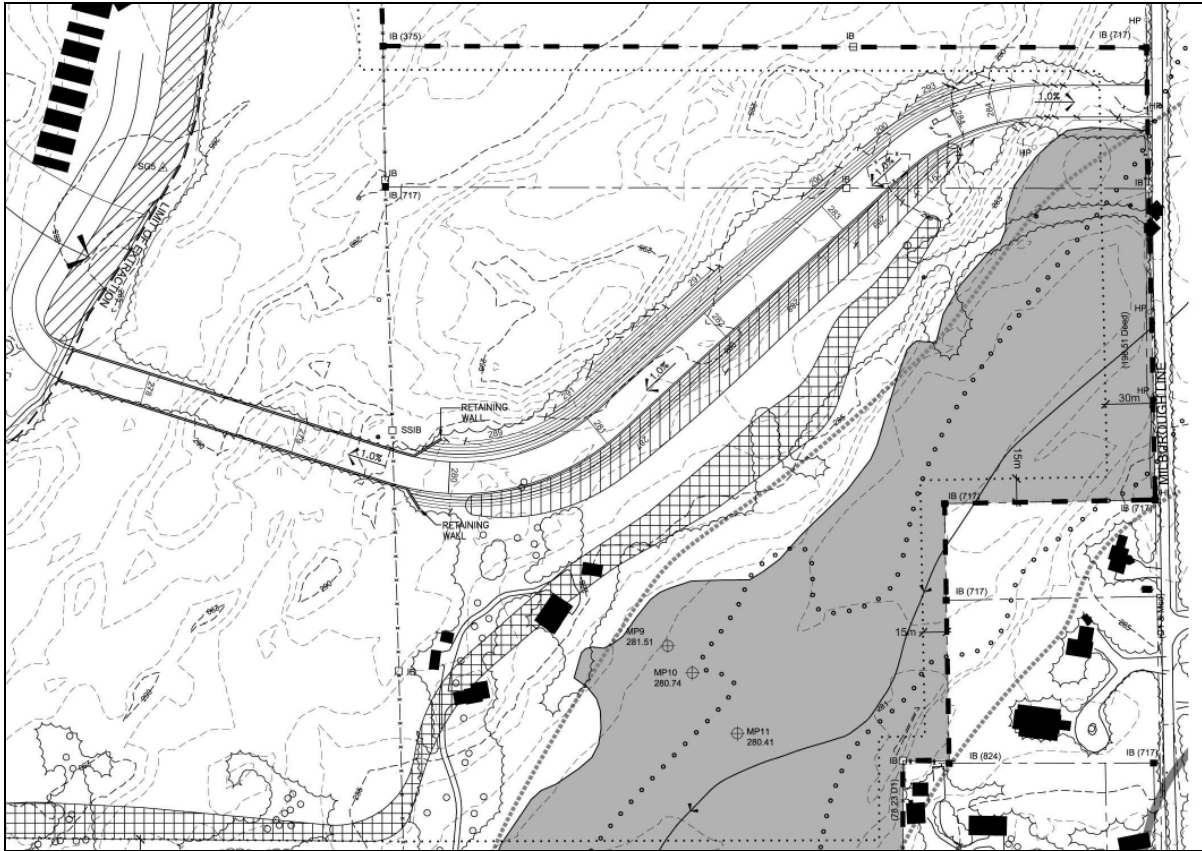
Recommended Design of Site Access on Milborough Line
